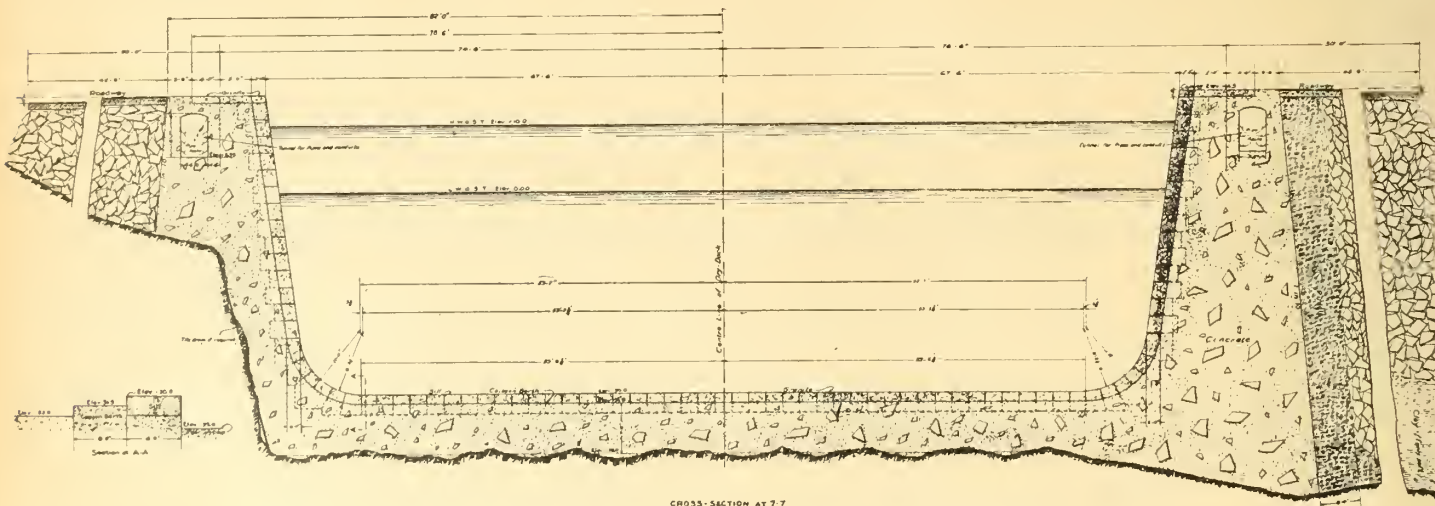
Esquimalt Drydock Cross-section at Caisson Berth and Entrance Sill.
